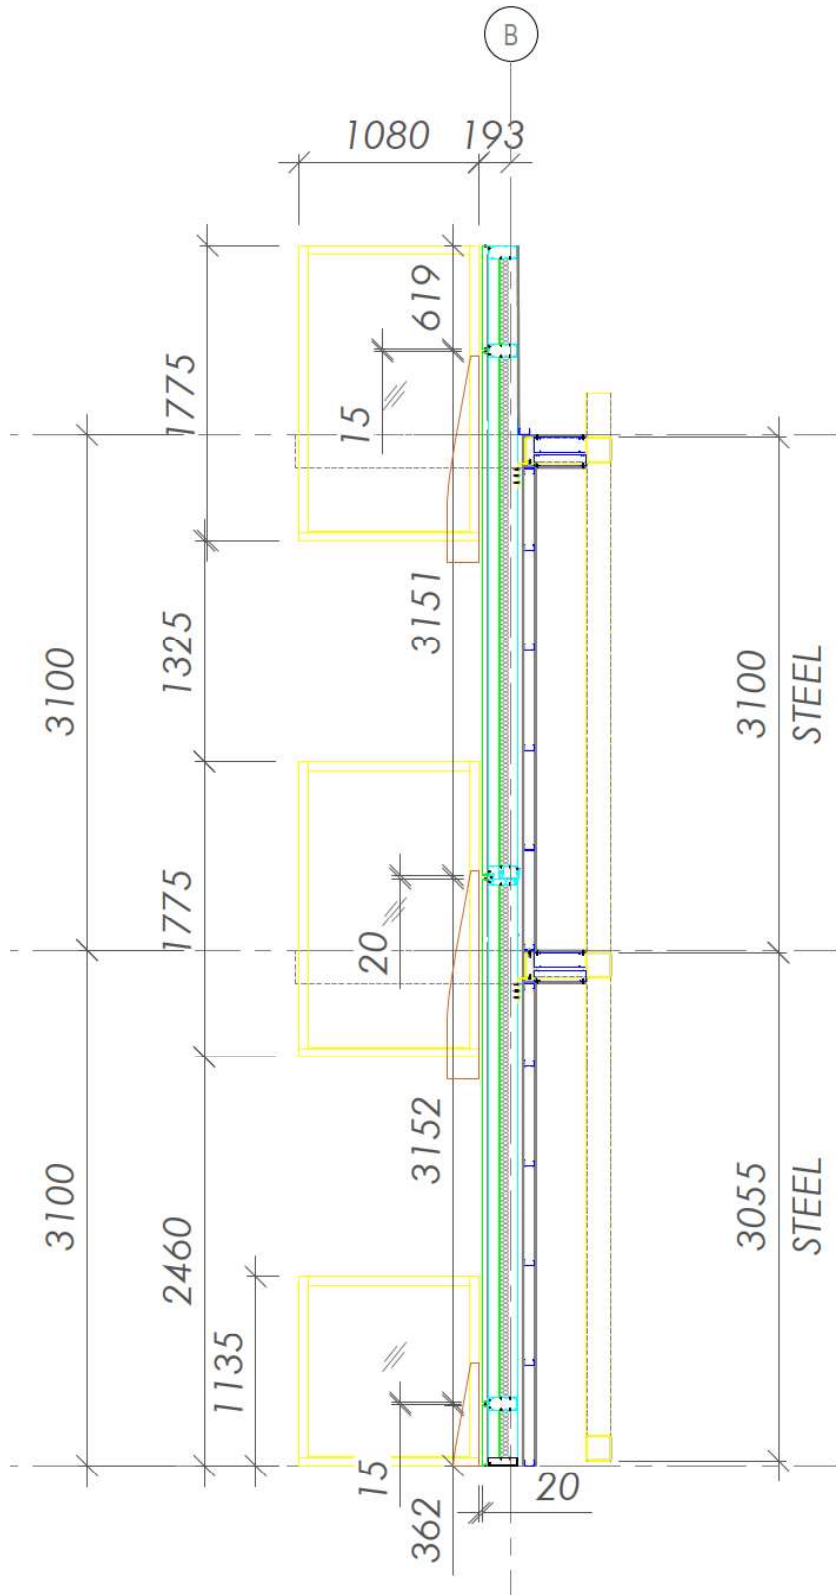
Elevation view of main wall balustrades and wing wall ACP curtainwall dimensions
